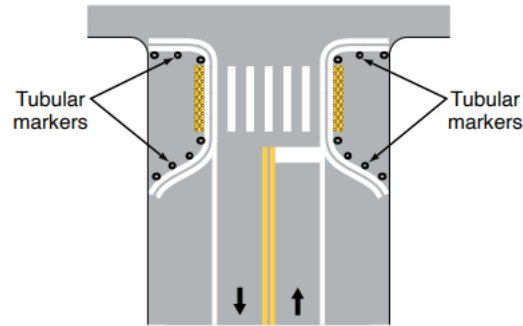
J-6. Examples of Sidewalk Extensions Designated by Pavement Markings and Channelization
